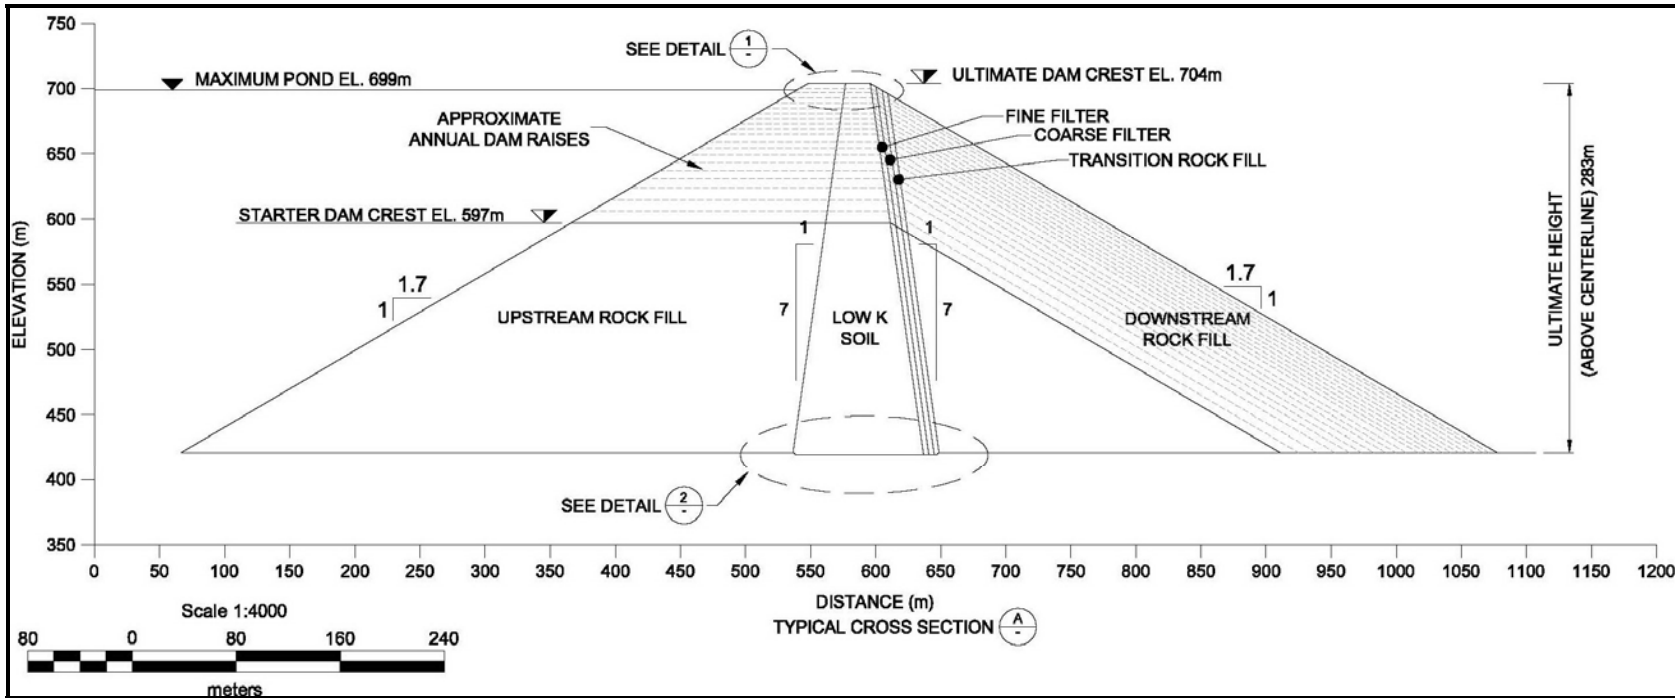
Scott Creek – Proposed TSF – Typical Main Dam Section
